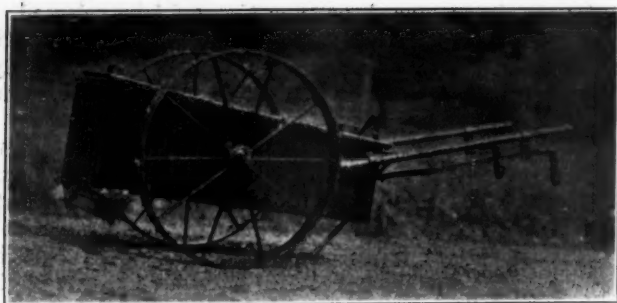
TYPE OF DISTRIBUTOR USED IN APPLICATION OF SEAL COAT IN THE CONSTRUCTION OF THE BITUMINOUS CONCRETE PAVEMENT, TYPE A, AT ASHOKAN, N. Y.
